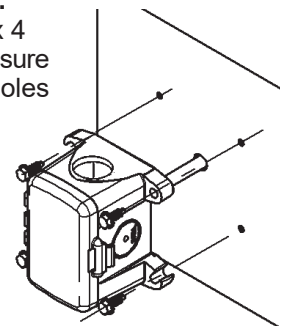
BAPI-Box 4 (BB4) Enclosure Mounting Holes
